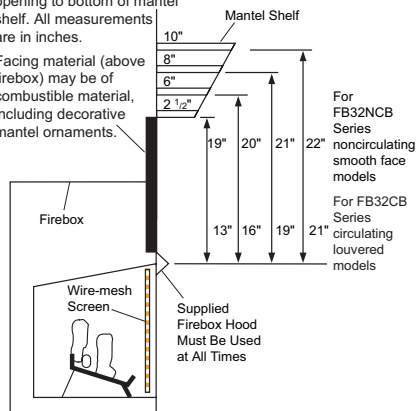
Minimum Mantel Clearances for Built-In Installation
